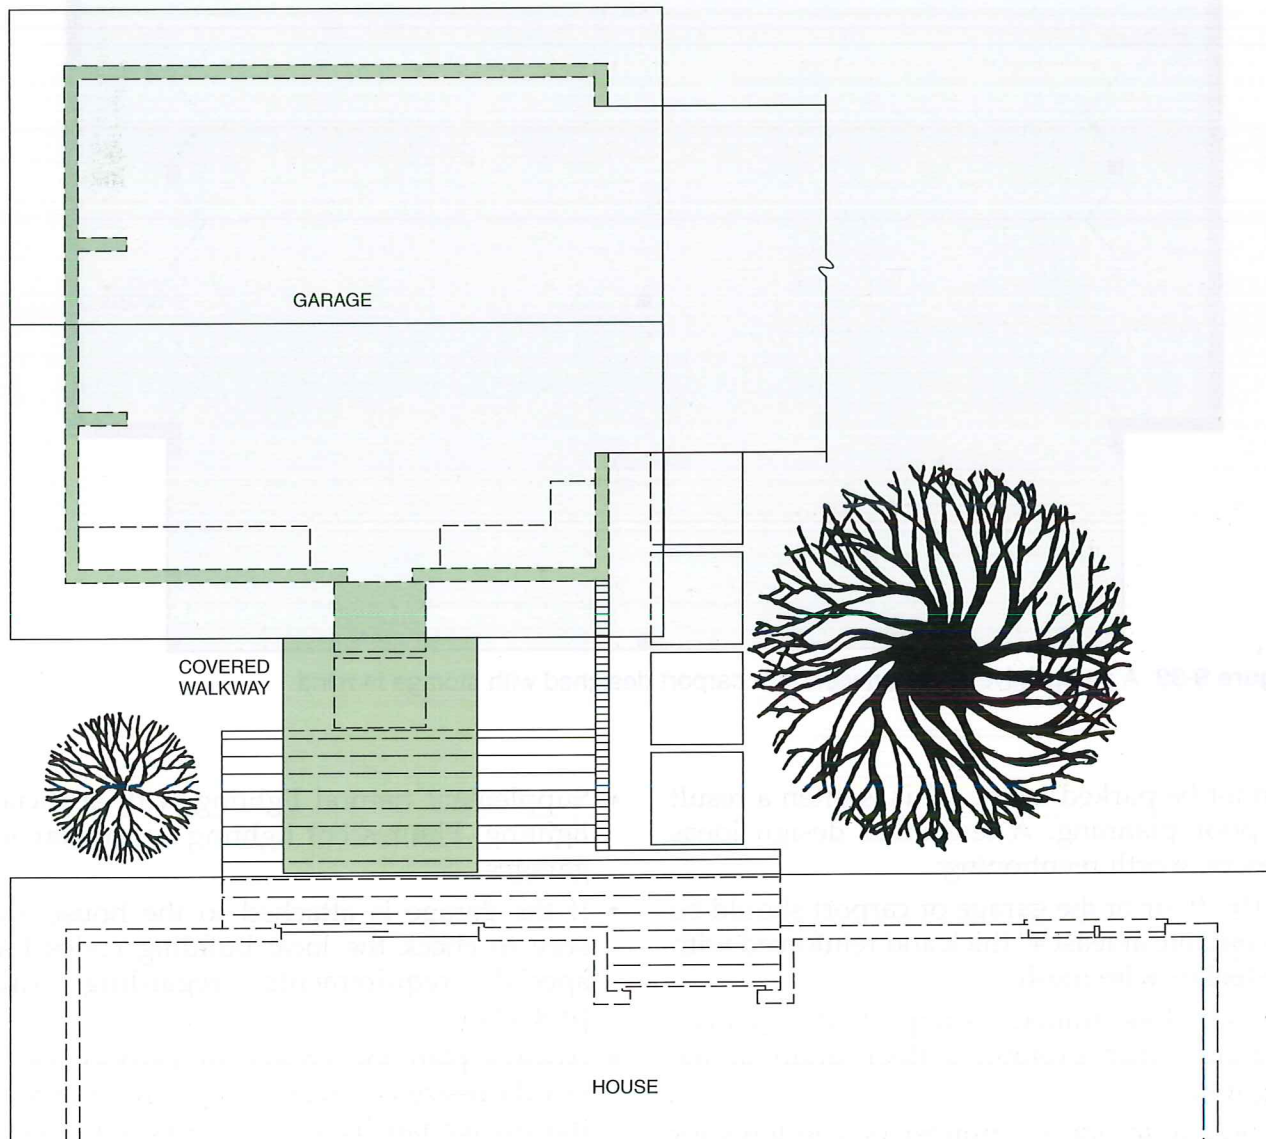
This plan shows a detached garage with a covered walkway to the house.
